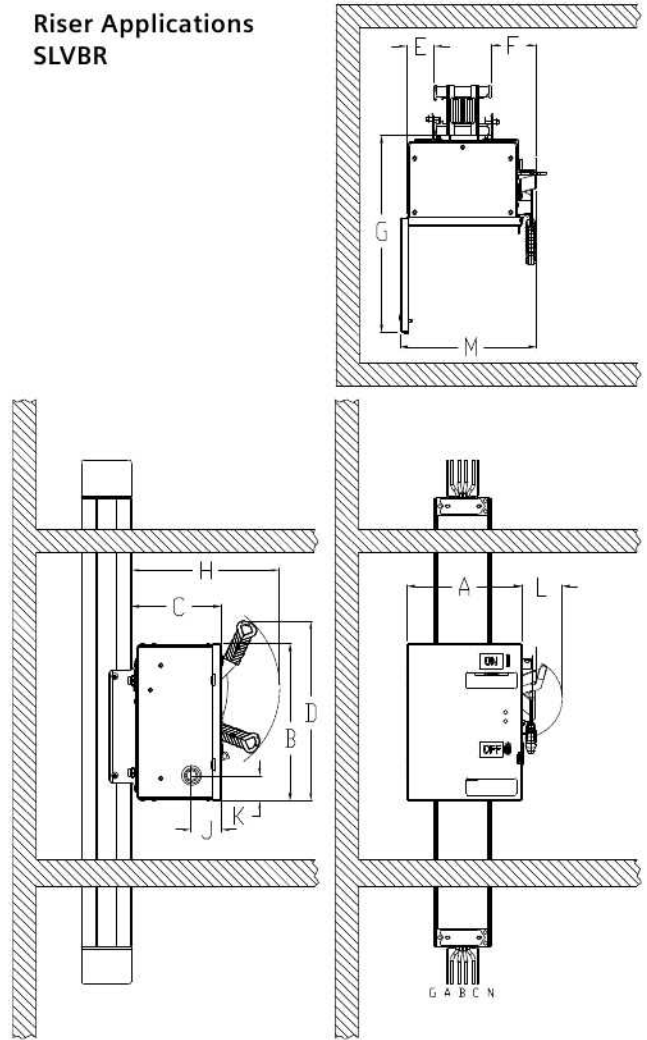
Minimum Installation Clearances - Plug-In With SENTRON Bus Plugs
